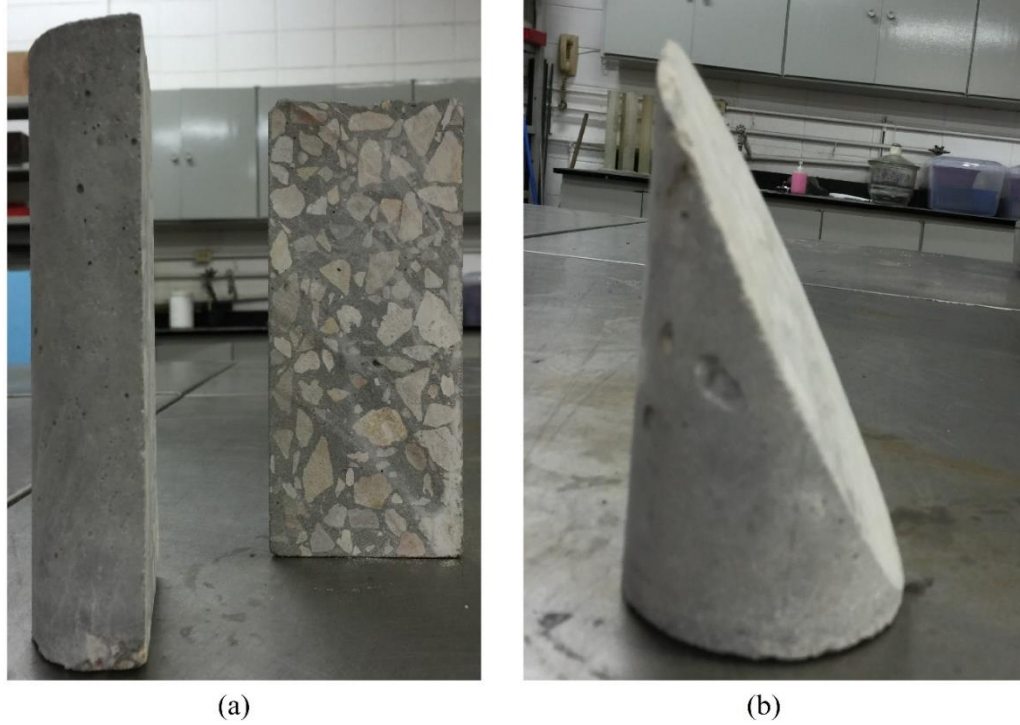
(a) Half split cylinders (b) Slant cut cylinders
